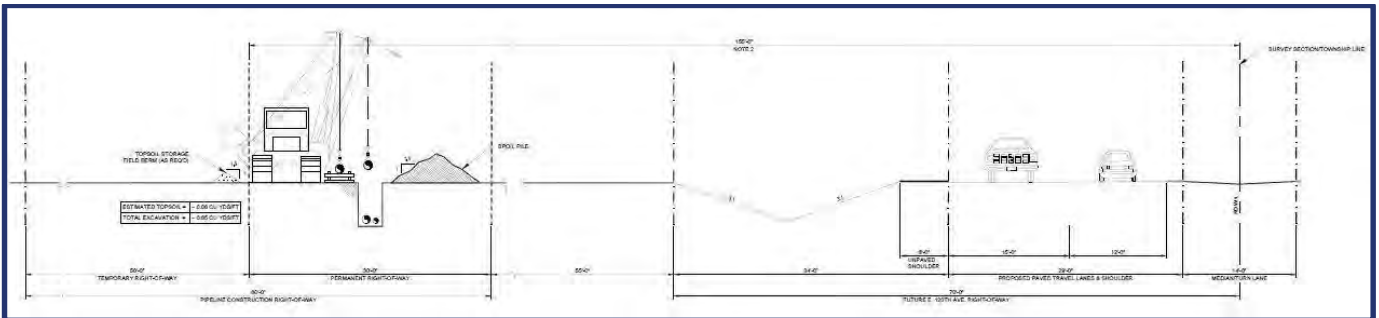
E. 124th Ave. ROW Ditch Profile, Collector (Rural)
